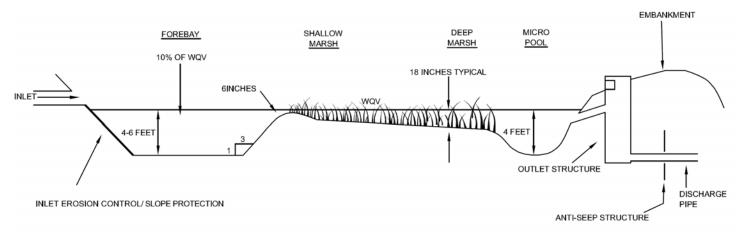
C. Typical Constructed Shallow Wetland (Profile View)
